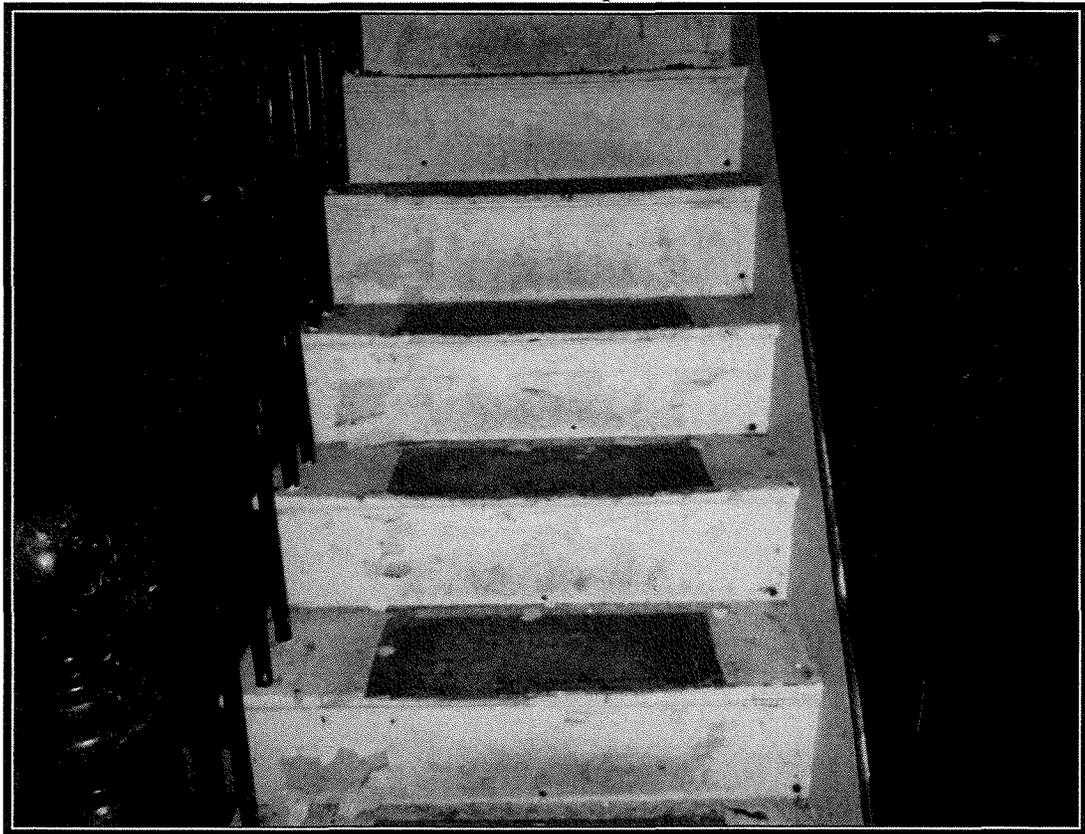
Stairway lacking Code required guard/handrails. Excessive riser heights and insufficient tread depths.
